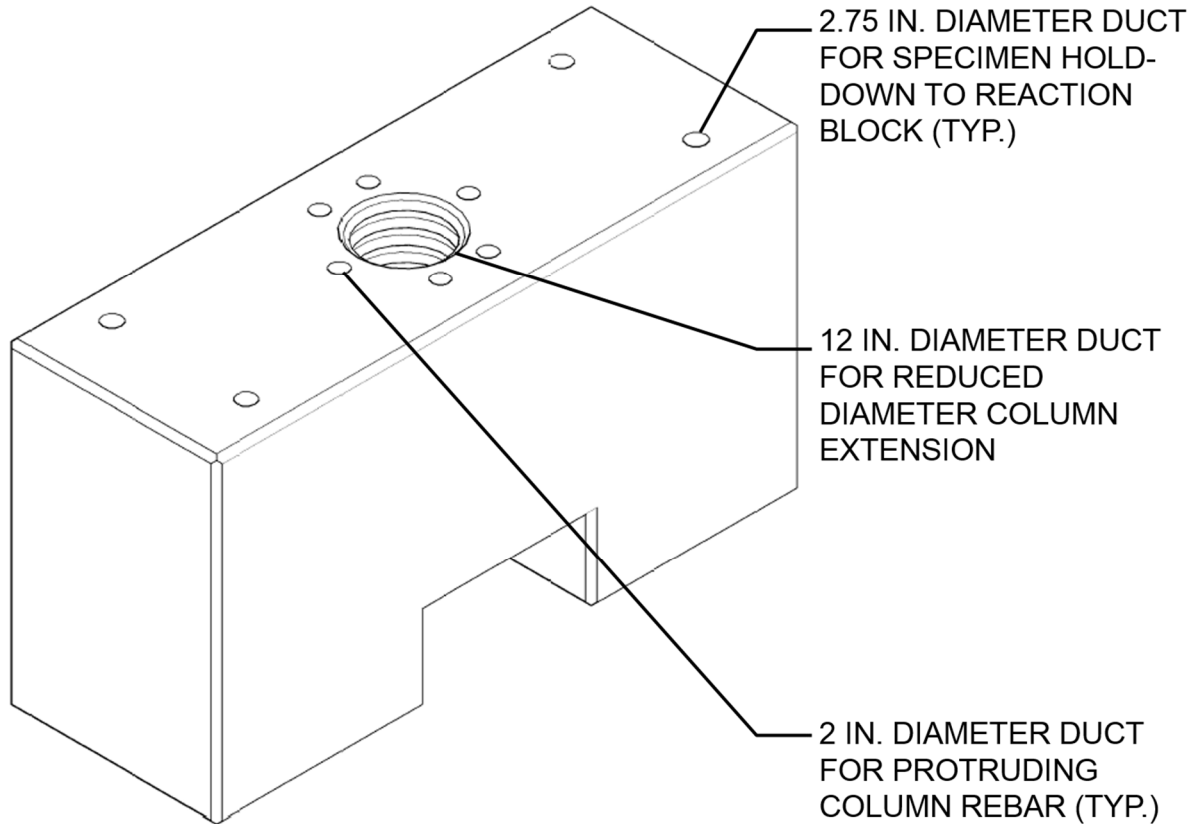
Isometric view of cap beam (from southeast perspective).
